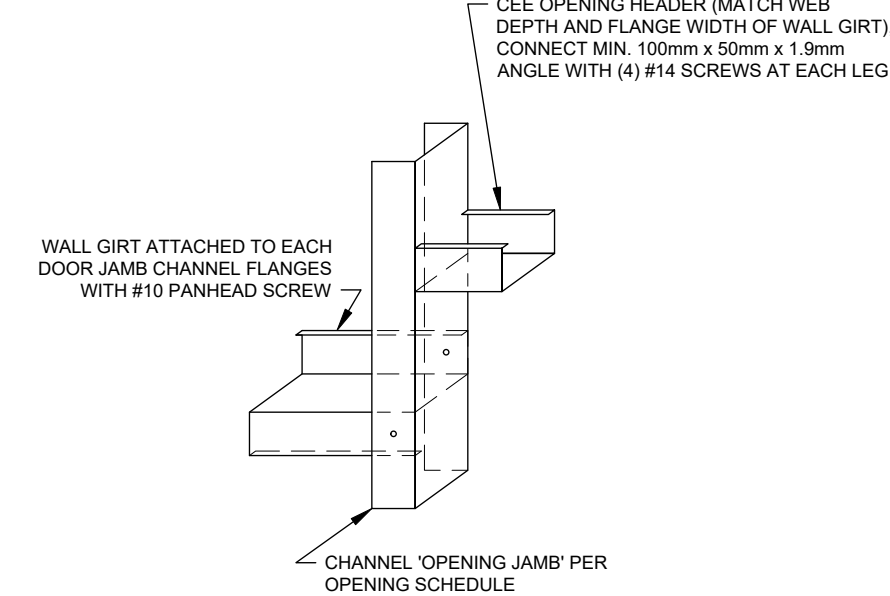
DETAIL DIMENSIONS ARE SHOWN IN MM UNLESS SPECIFIED OTHERWISE
